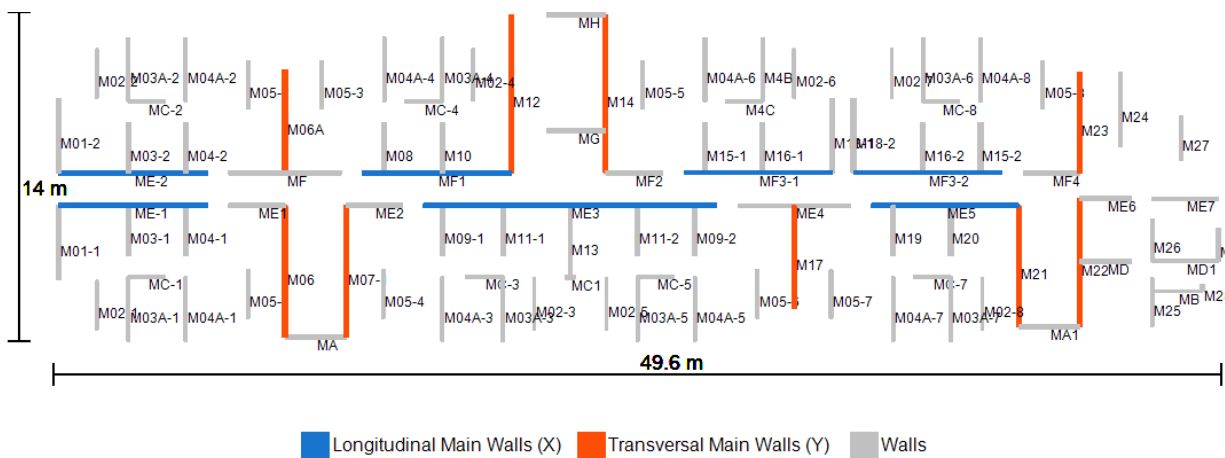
Localization and Nomenclature of Main Walls in the Structural Model.
